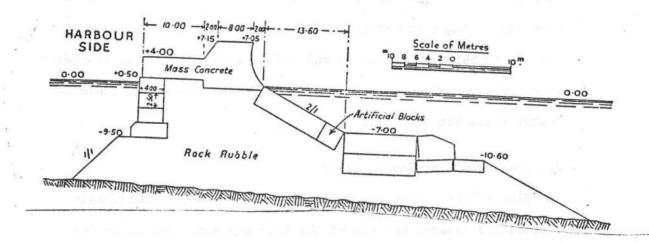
Sections Showing Failure of Jetty at Algiers
